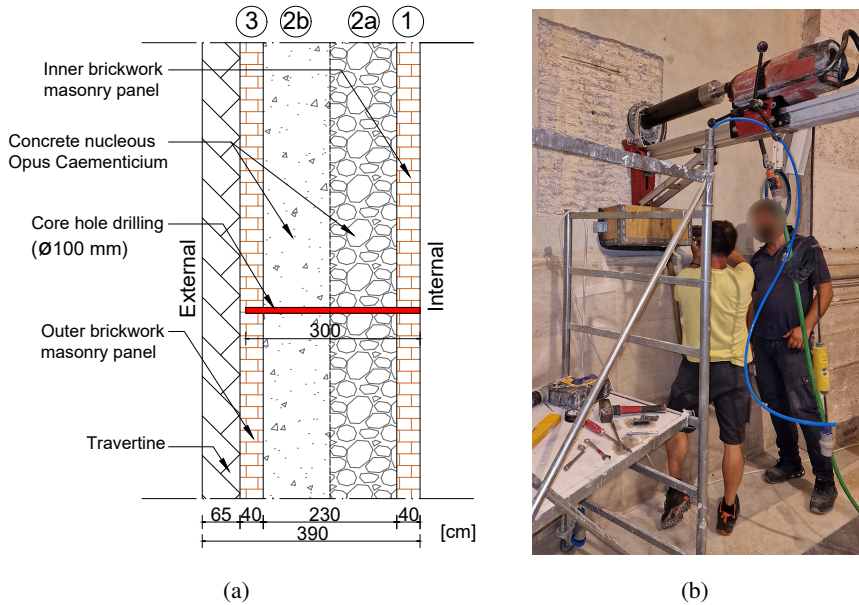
(a) Schematic stratigraphy of a multi-leaf wall panel in the Atrium of St. Peter's Basilica; (b) execution of a core drilling test.
